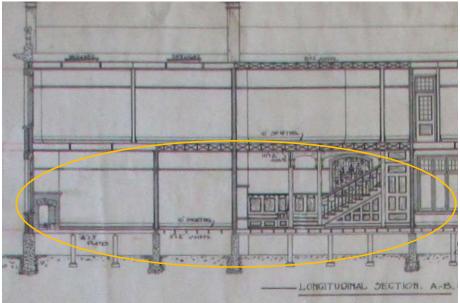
Location of subject area showing a section through the Reception Hall with main staircase, Alcove and Billiard Room, which was potentially not constructed in accordance with the original plans.
